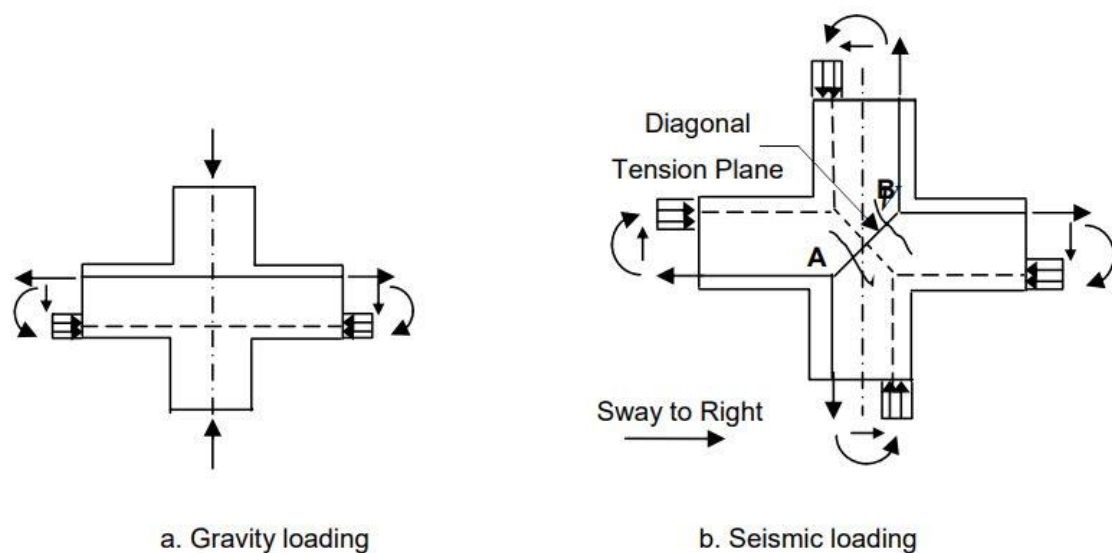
Forces acting on a typical beam-column joint (Uma and Prasad 2006; Khan 2014; Kibria 2014)
